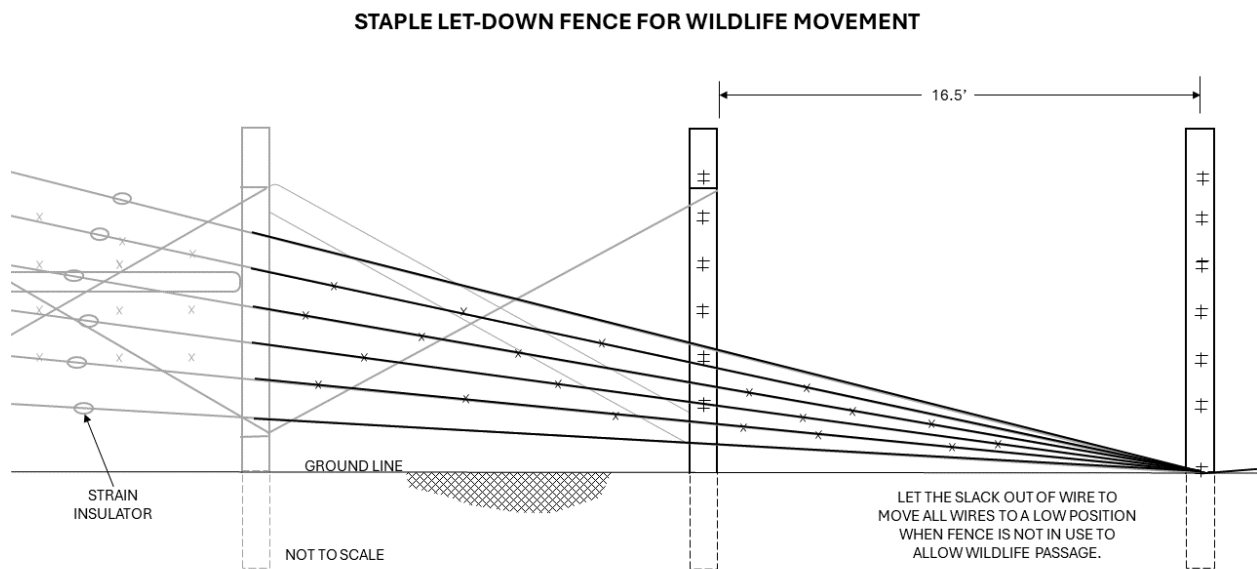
Drawing of a staple-type let-down fence with wires laid on ground.
